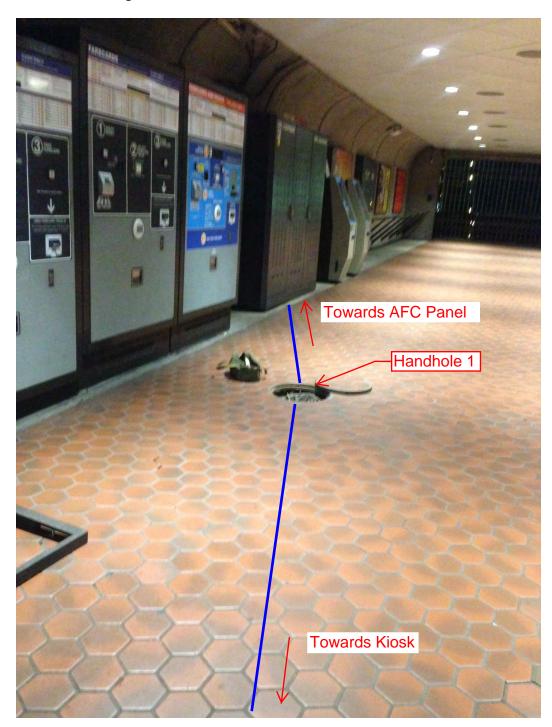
Existing Duct run from Kiosk to Hand Hole 1 on mezzanine floor.
